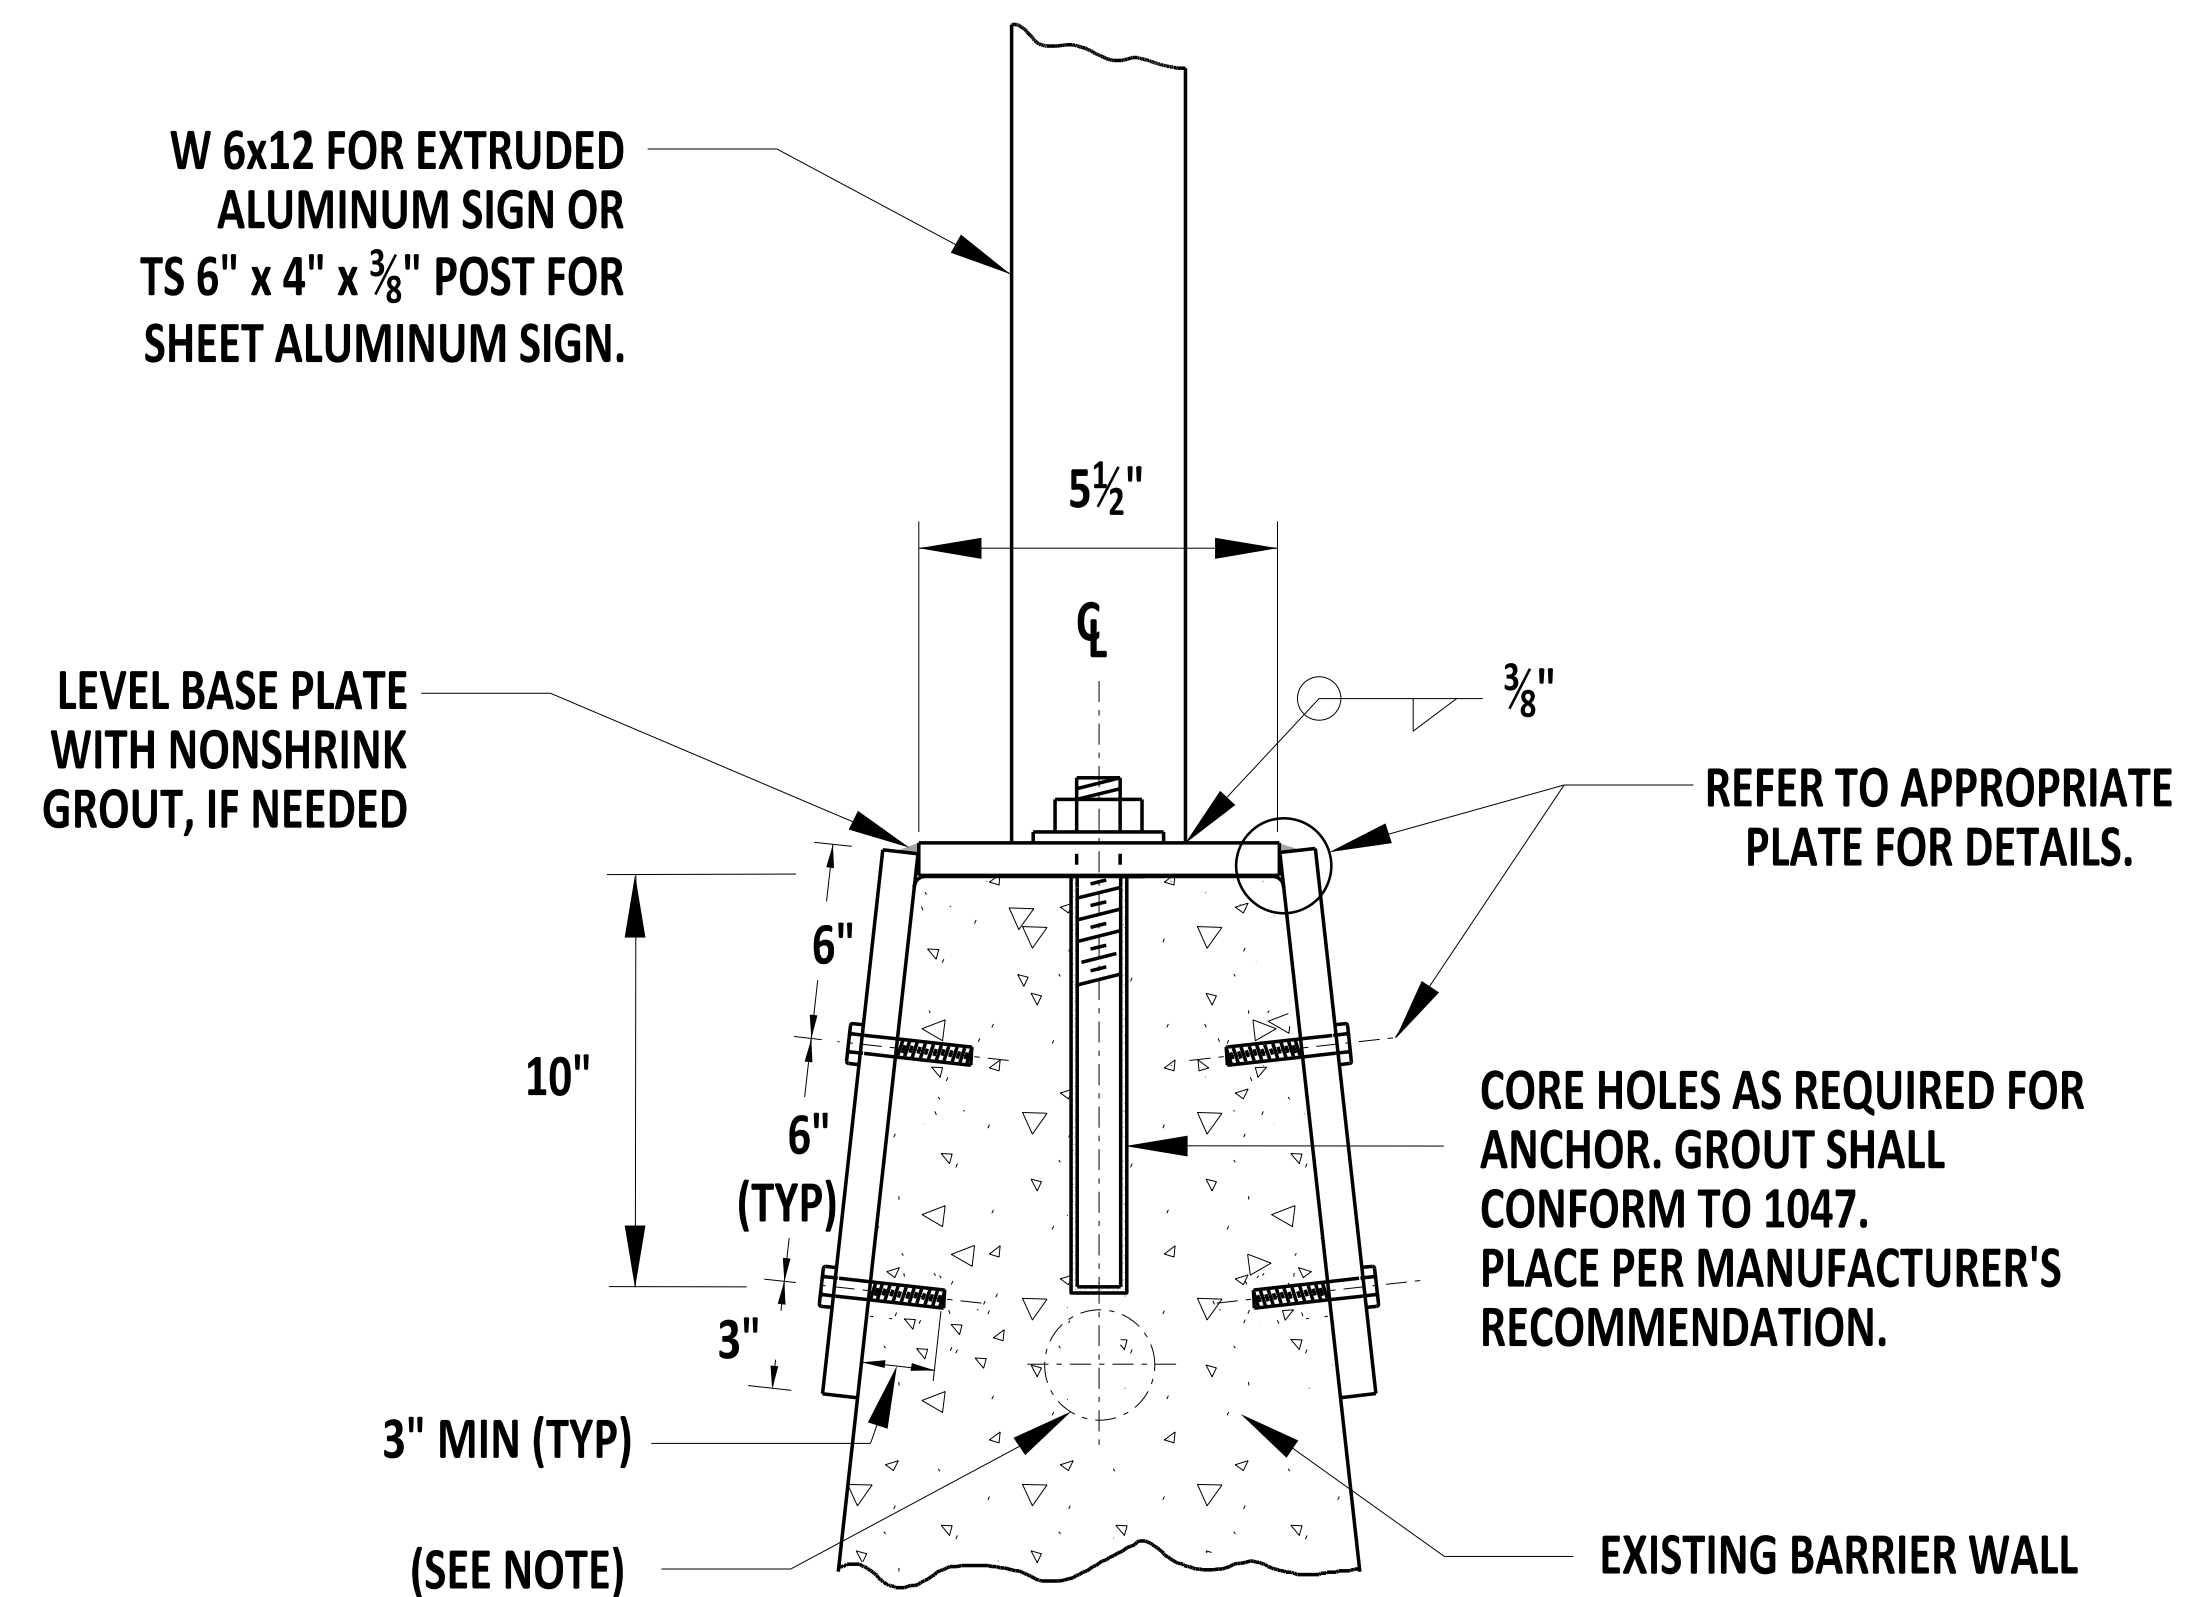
DETAIL 'A' - SIDE VIEW EXISTING BARRIER
